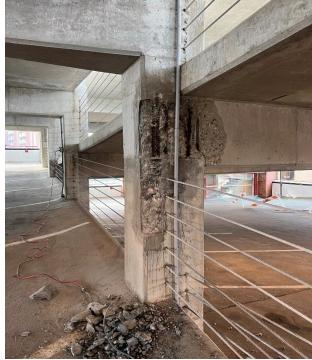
Column 13E inspection opening at Level 6 PT beam end (unsound previous patch repair removed).
